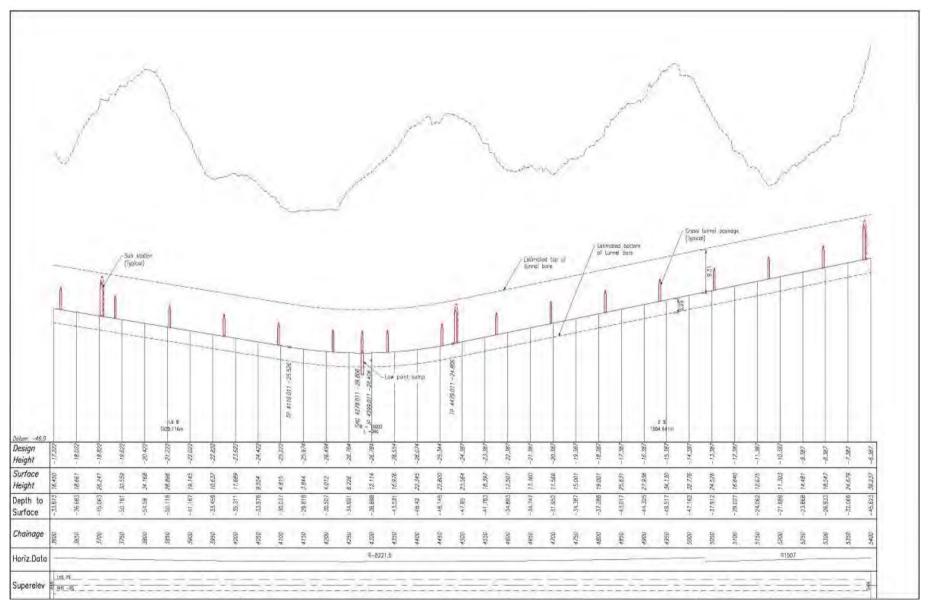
Westbound tunnel vertical alignment – Thomas Street to Plunkett Street
